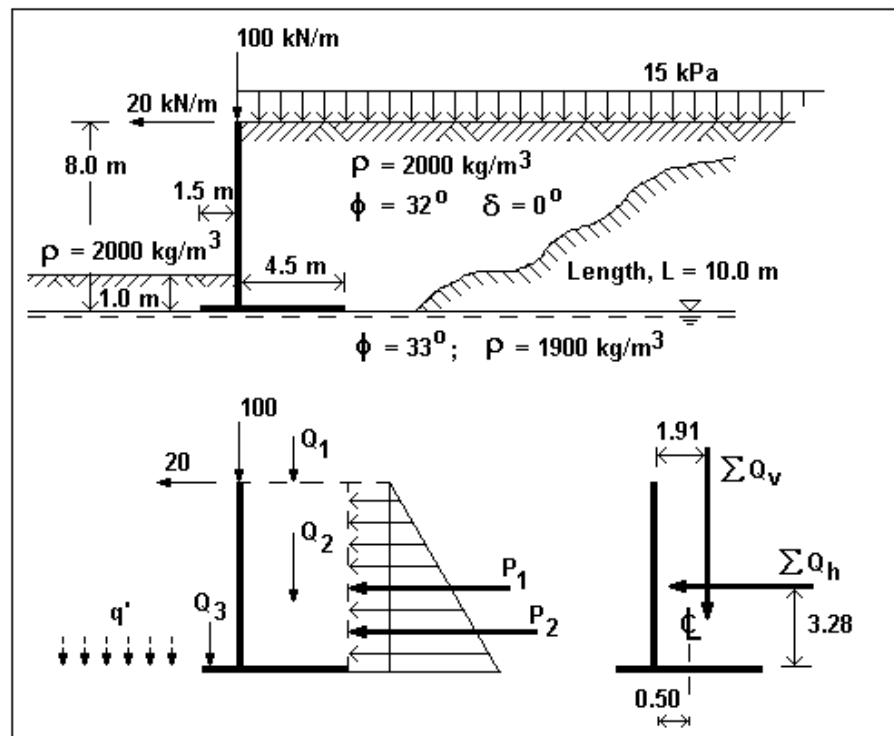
Cantilever wall example (Fellenius, 1995)
